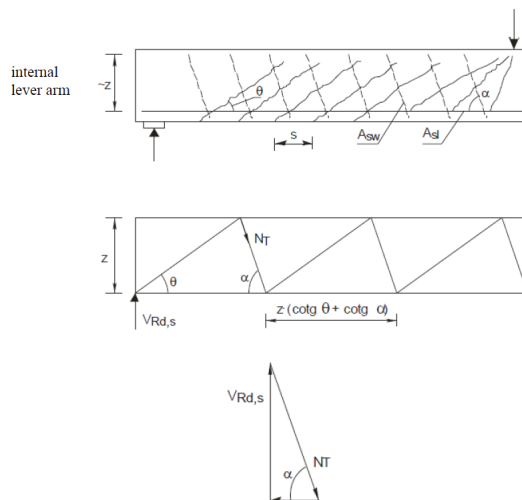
truss model used to calculate shear capacities for beams with shear reinforcement present [35]
